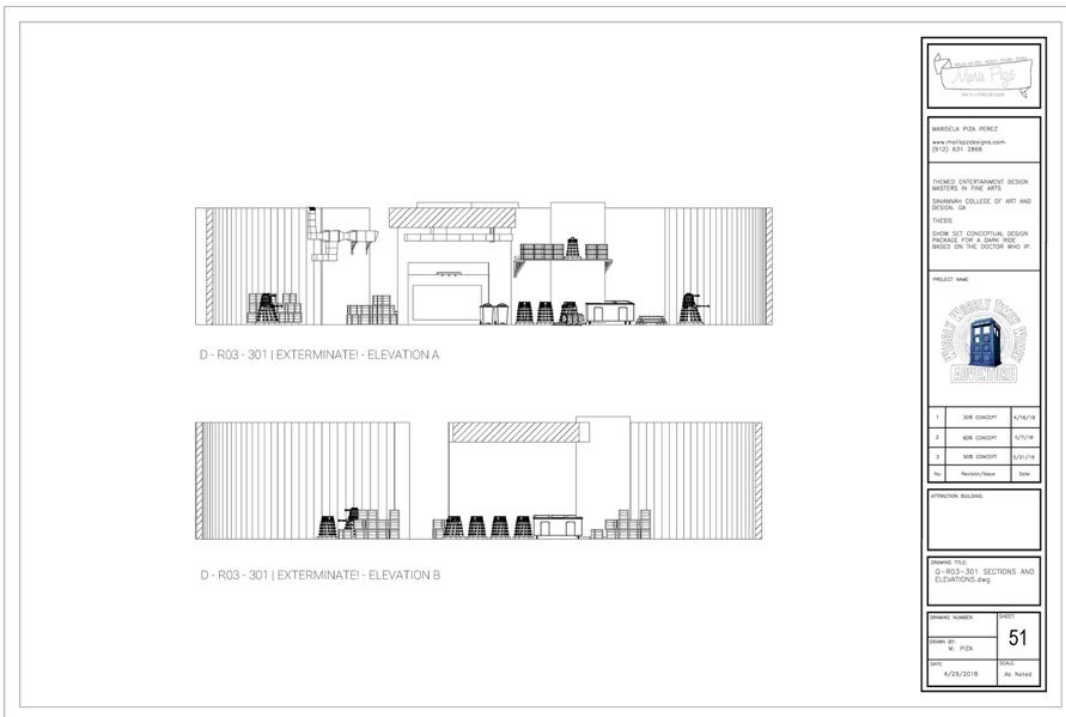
D-R03-301 | Exterminate! - Sections and Elevations
